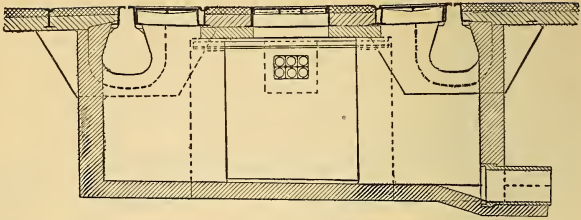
Drainage at Manhole of Conduit, Metropolitan Railroad, Washington, 1895.
